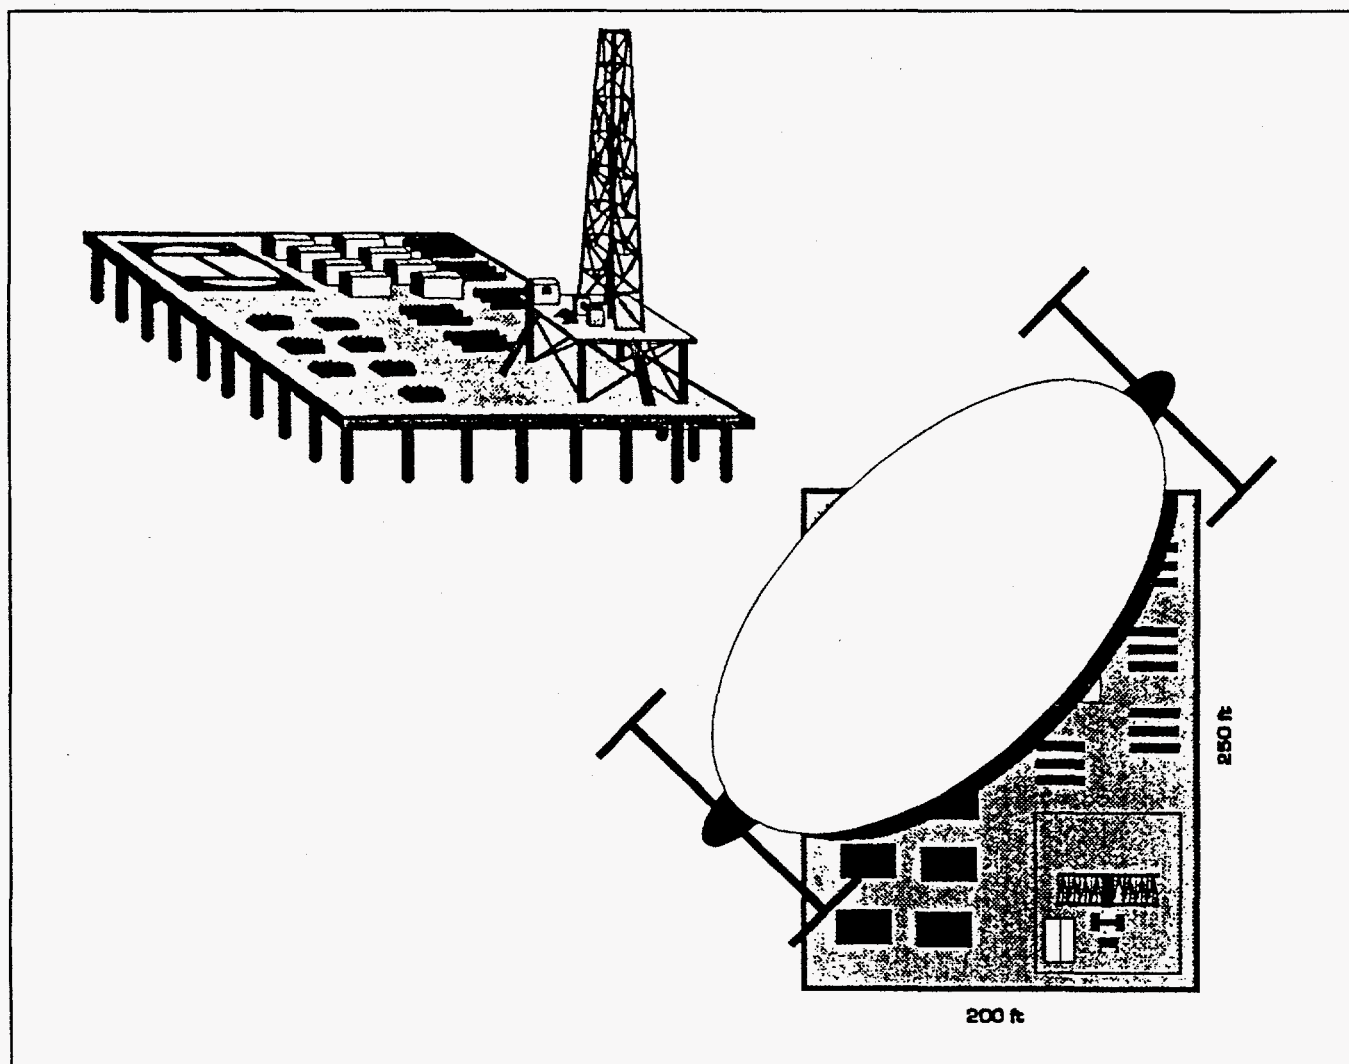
Schematic of pile driven platform (adapted from Stevens 1993a).
